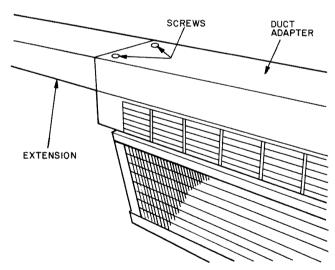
REMOVING CHASSIS WITH DUCT ADAPTER FROM SLEEVE
